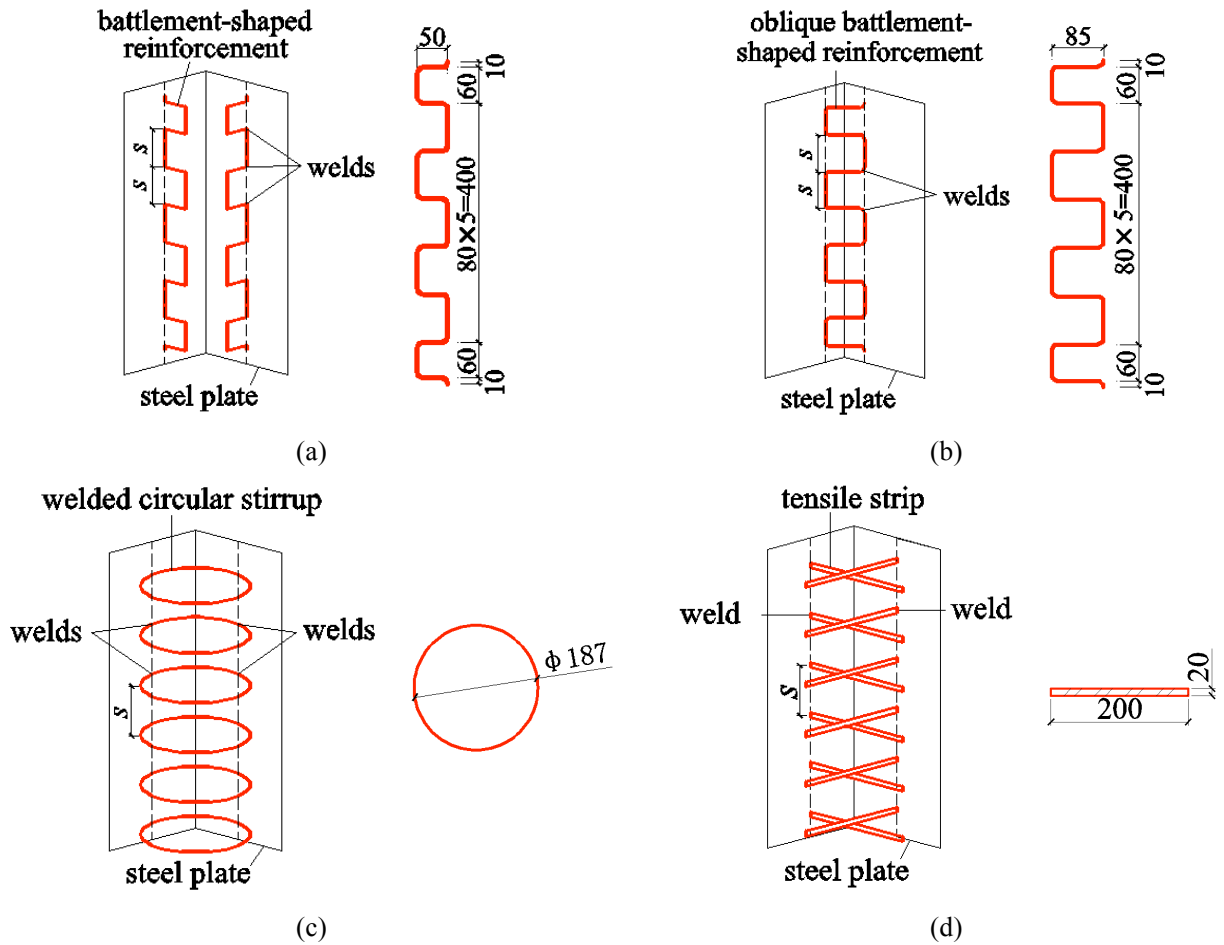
Longitudinal arrangement of stiffeners on two adjacent steel plates (unit: mm)
